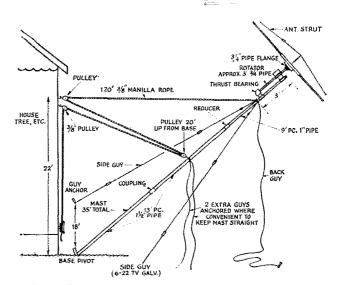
This simple pipe mast can be raised and lowered by one man. Details of construction will be found in the text.
